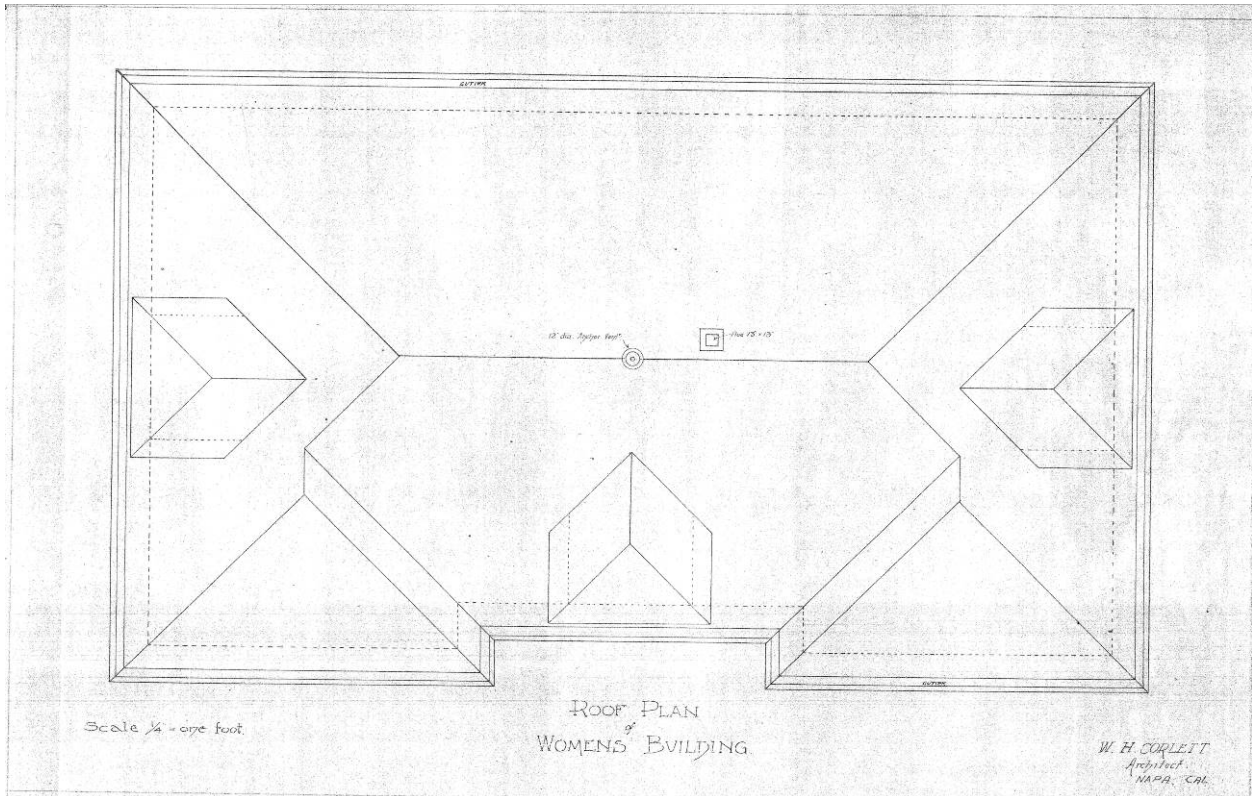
W.H. Corlett, Roof Plan of Women's Building, undated c1912.
